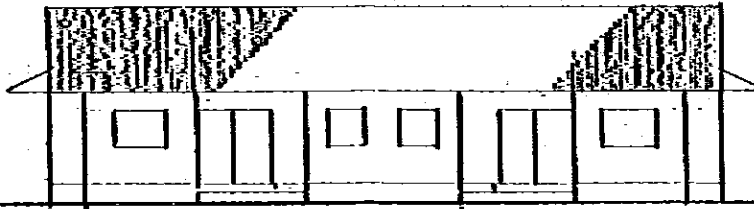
Floor Plan and General Drawings of Staff House (Type D)
